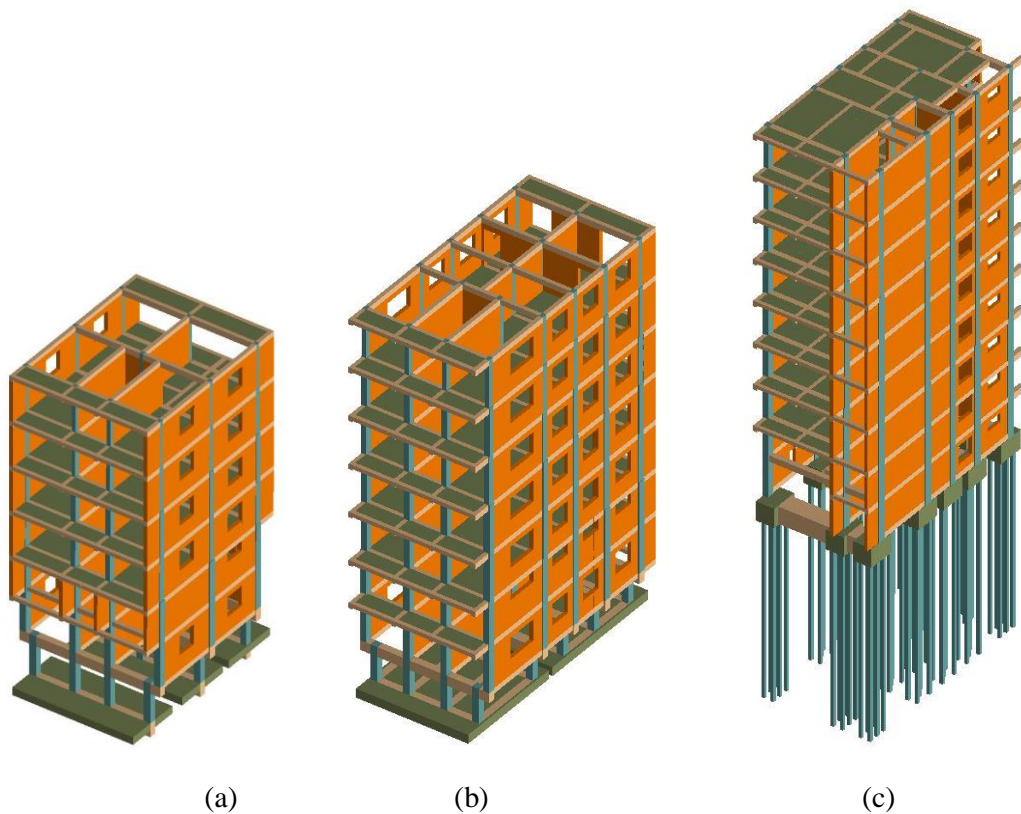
Structural 3D view (a) five, (b) six, and (c) eight story building (not to scale)
